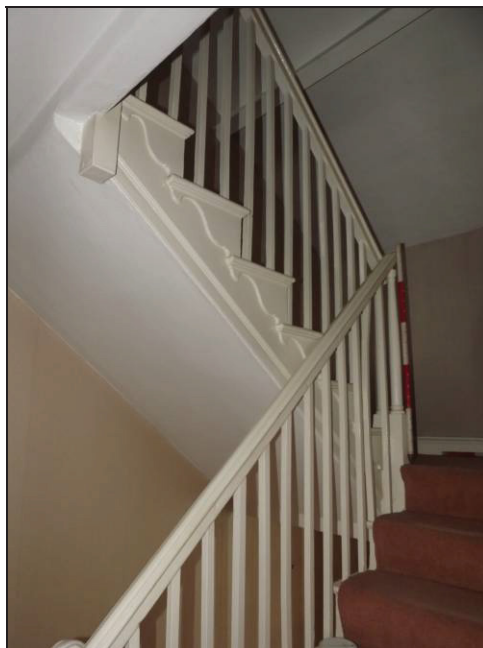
Detail of staircase as it ascends to the attic from Room 14
